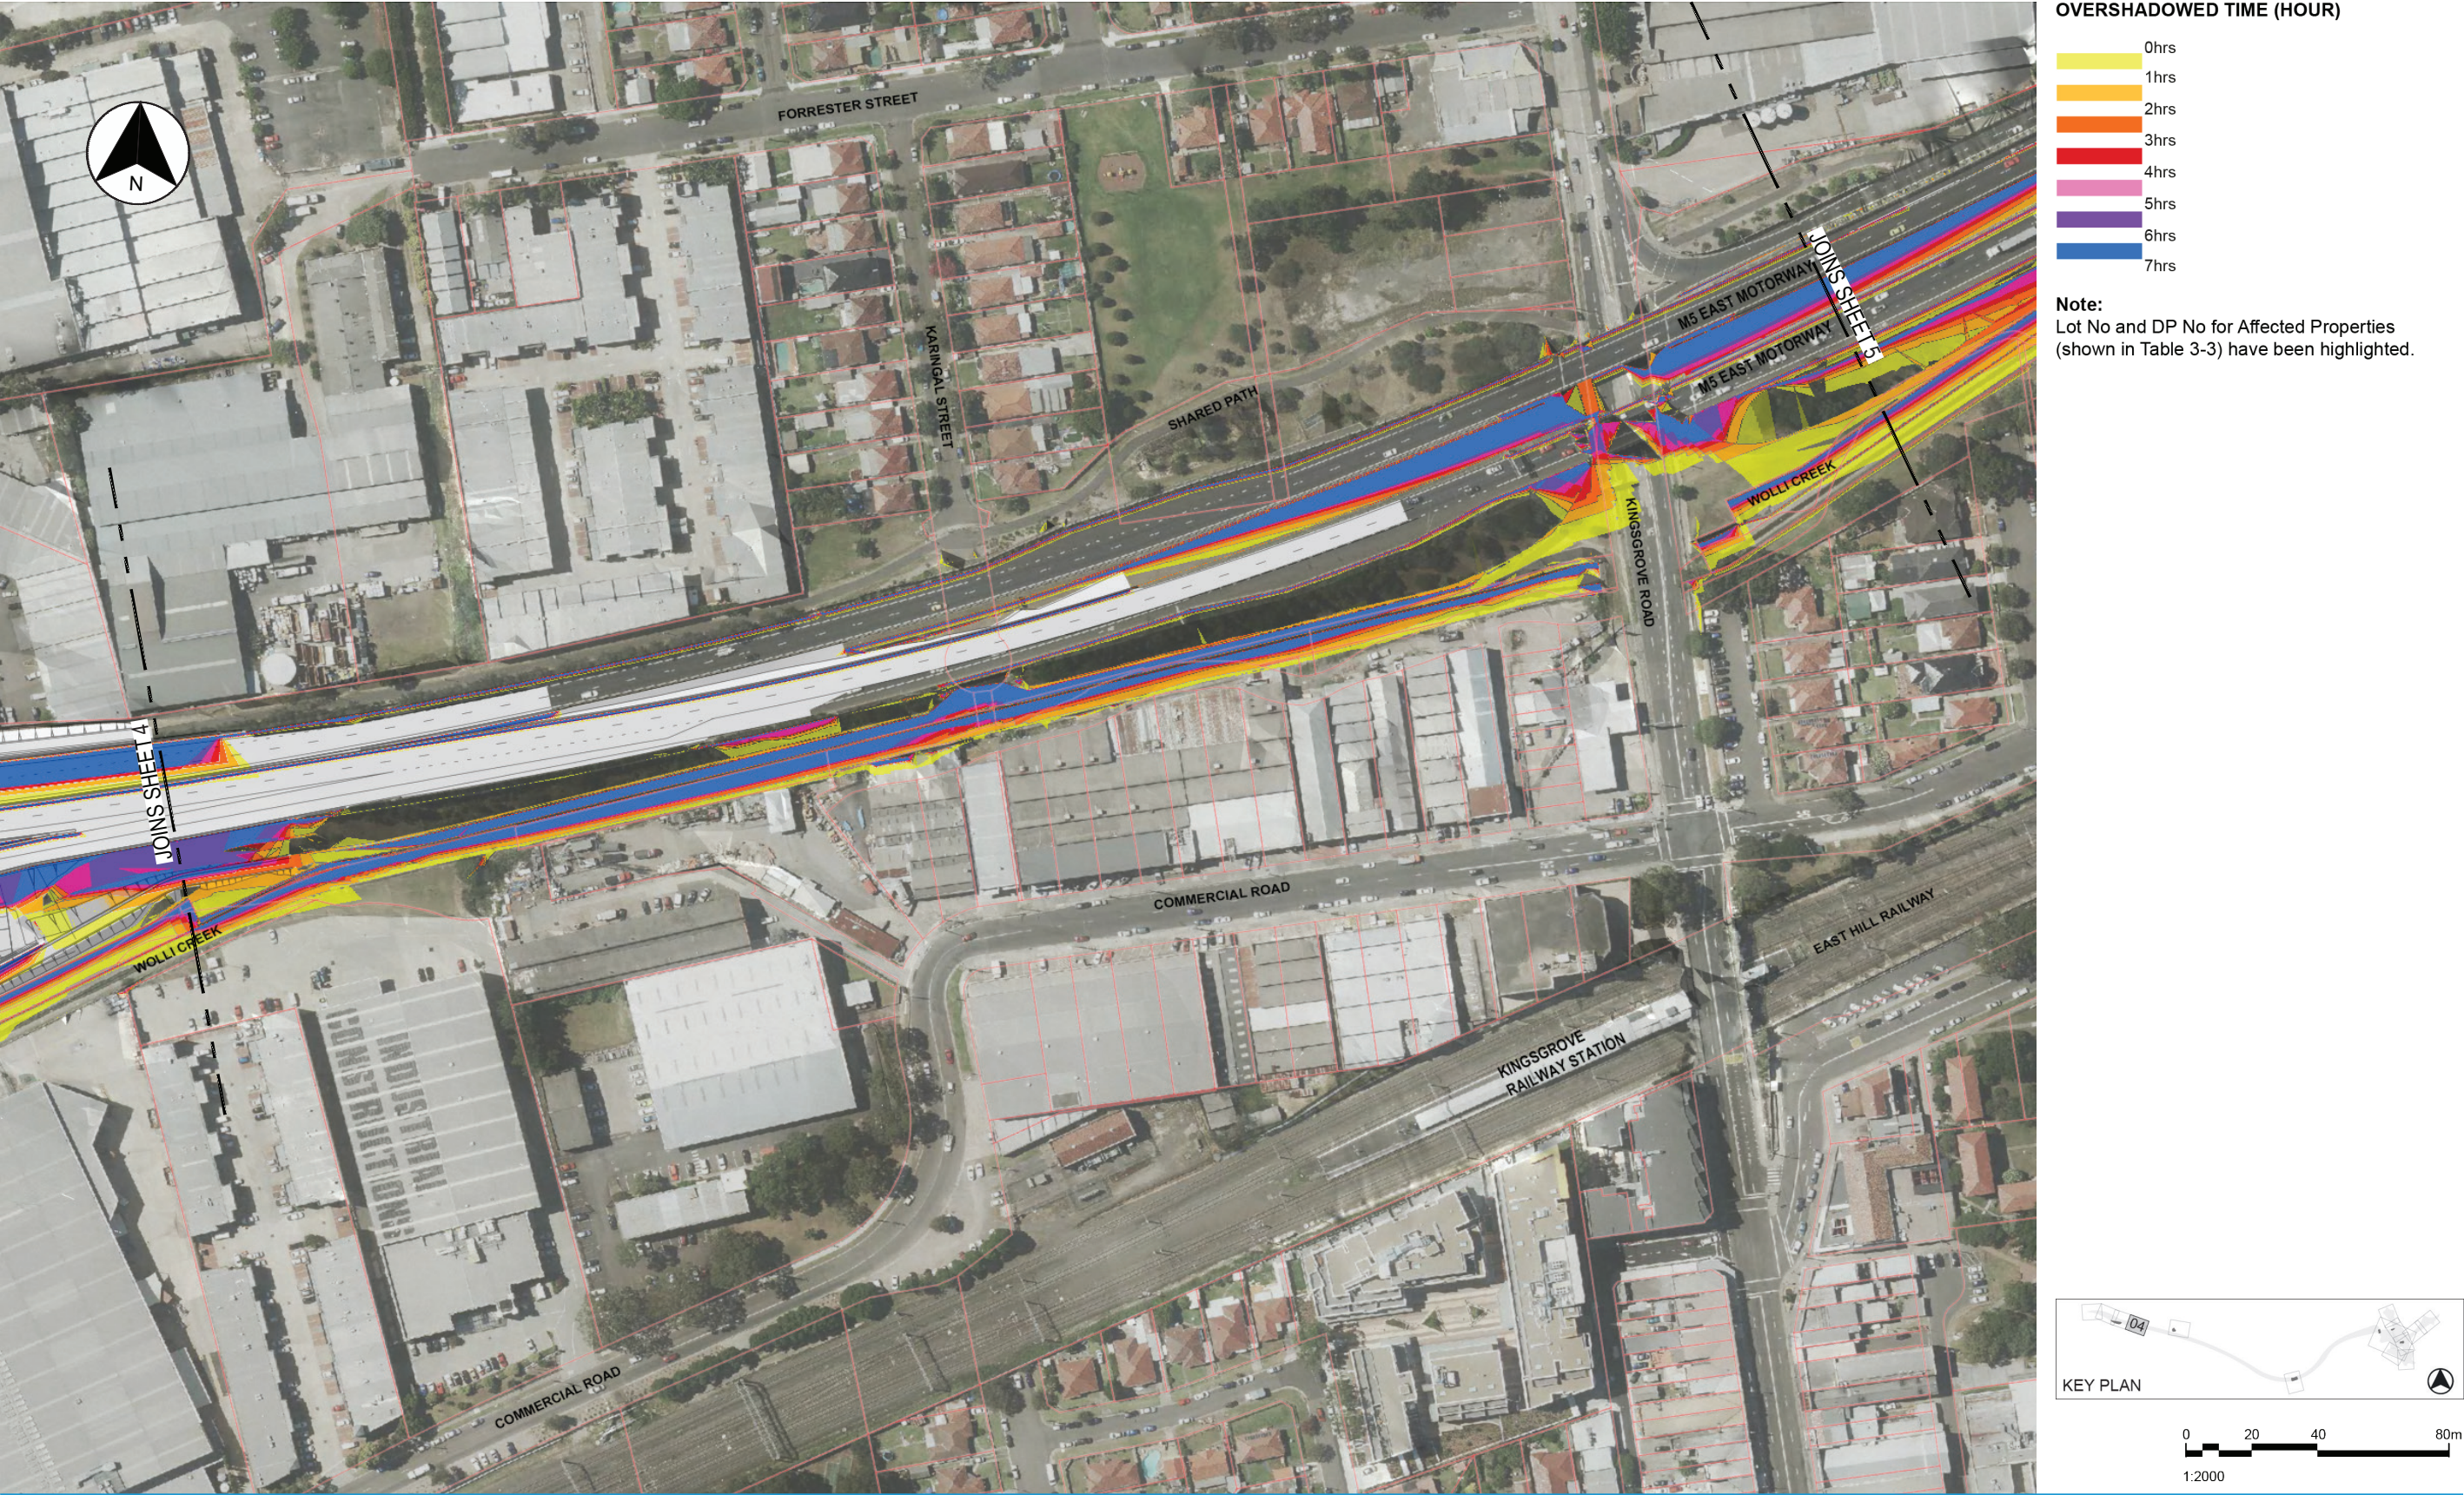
Overshadowing Assessment Plan - Sheet 4 of 14 - 1:2000
